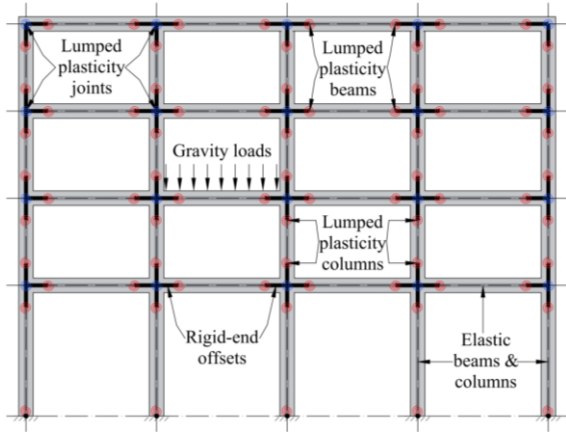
Geometric layout and nonlinear modelling strategy of the case-study frame
